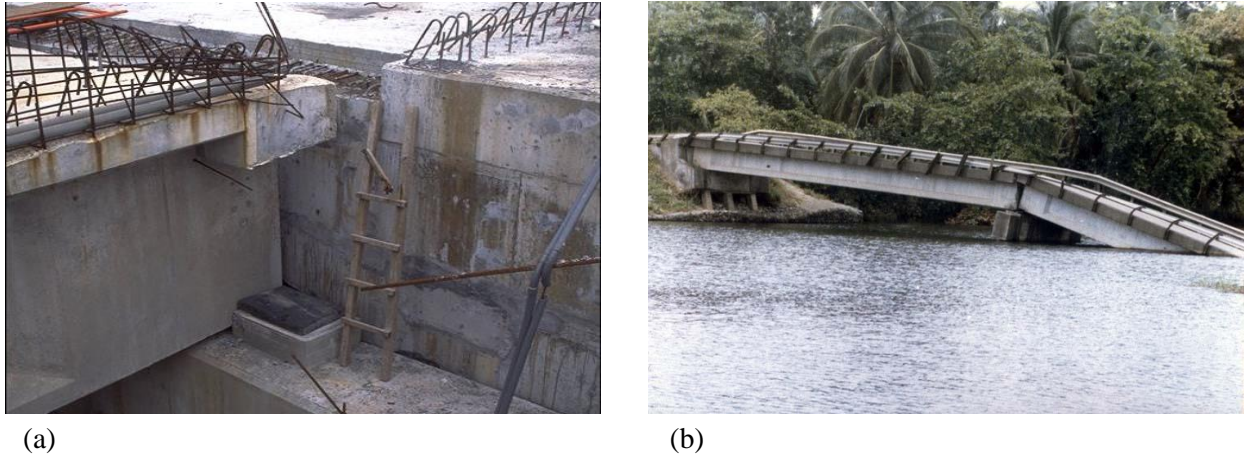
(a) Unseating between deck supported on bearing and abutment (Chi-Chi, Taiwan 1999) and (b) piers and abutment moved and collapsed into the river because of pier footings suffered liquefaction (Costa Rica, 1991).
